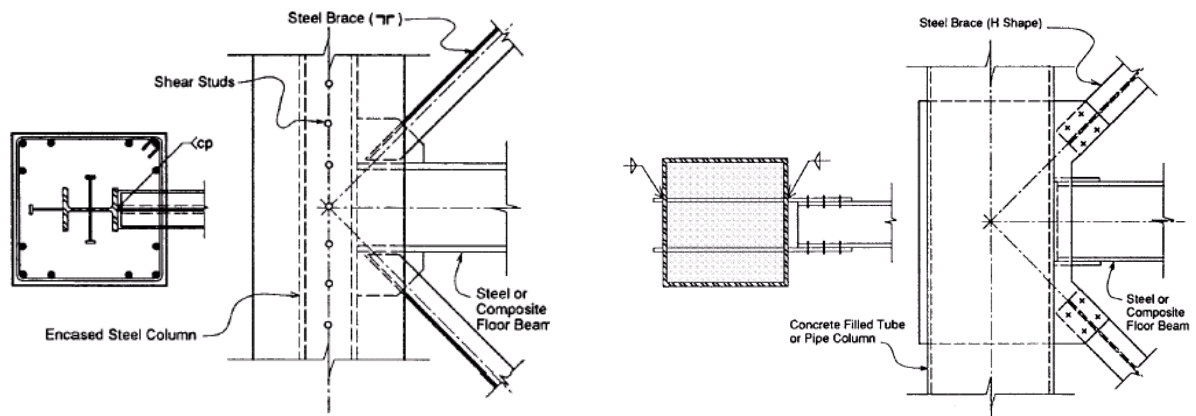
Brace-to-beam connection for CBFs: encased (*left*) and concrete filled column (*right*). (after AISC, 1997).
